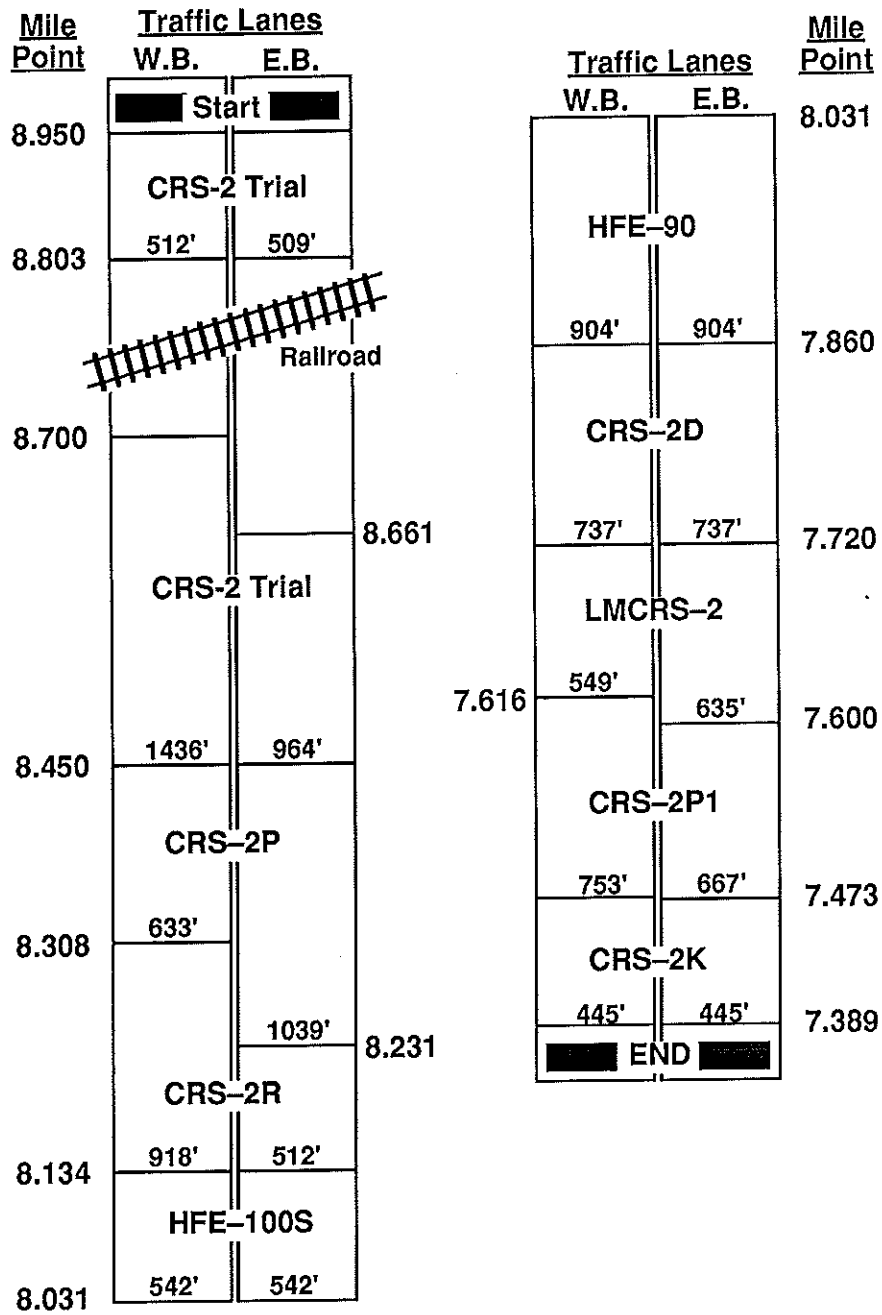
Polymer Modified Chip Seal, Secondary Test Sections
